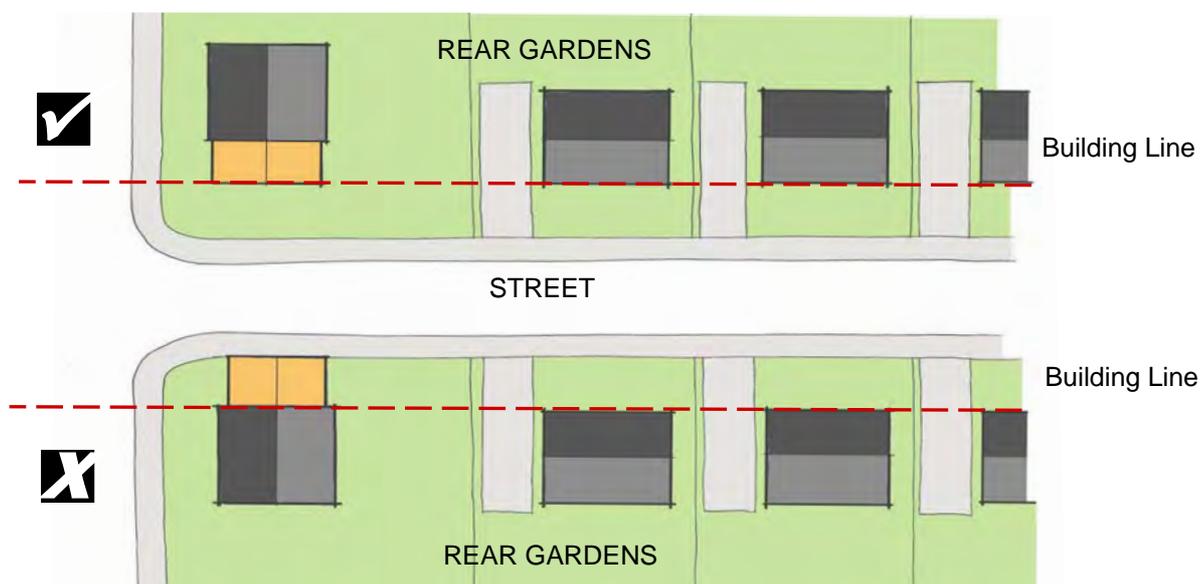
An extension on a corner plot should not extend beyond the building line in the adjoining street
